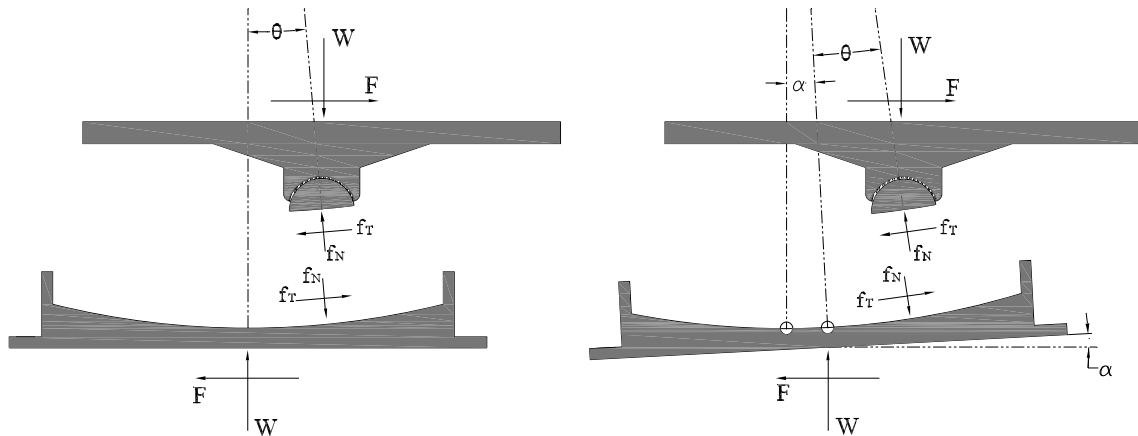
Single friction pendulum bearing with unrotated and rotated bottom surfaces (exploded 1D view)
